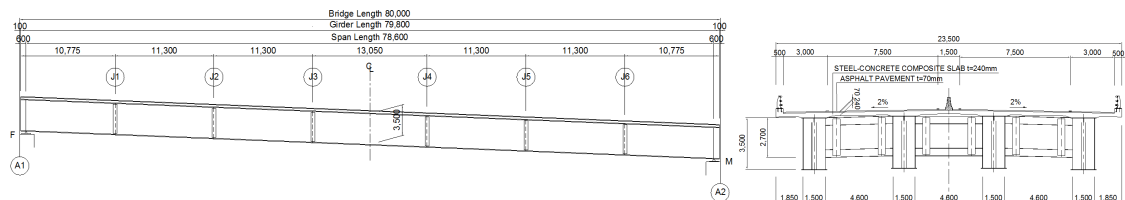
General View of Railway Overpass of South Approach Bridge
